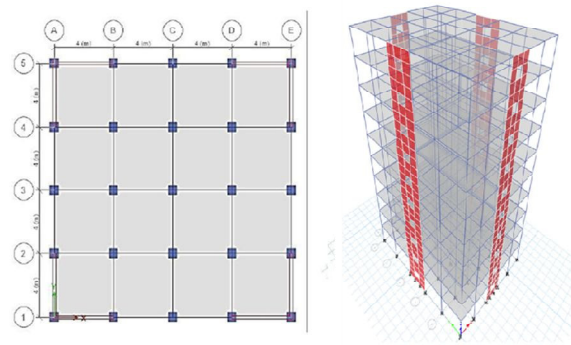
Plan and 3D model of shear wall structure with staggered opening of size (2mX 1.75m).
